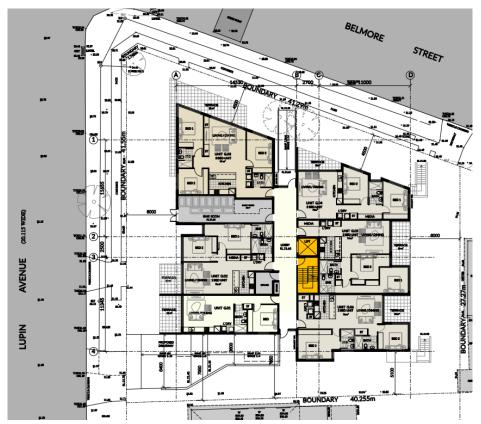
Ground Floor Plan extract showing the proposed layout of the development.
